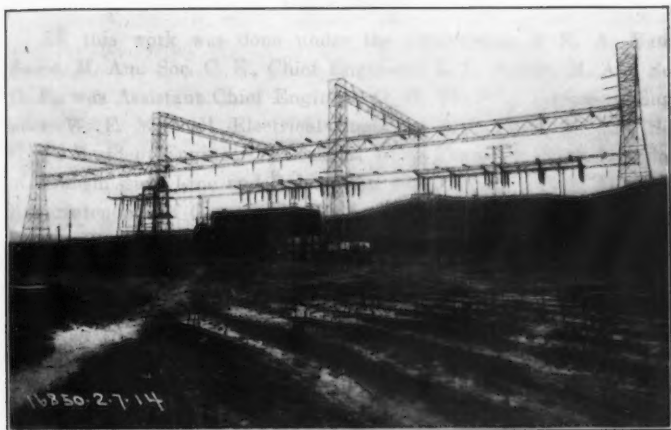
OUTDOOR SUB-STATION AT ANNISTON, ALA.; CONSTRUCTION IS TYPICAL OF ALL SUB-STATIONS.
